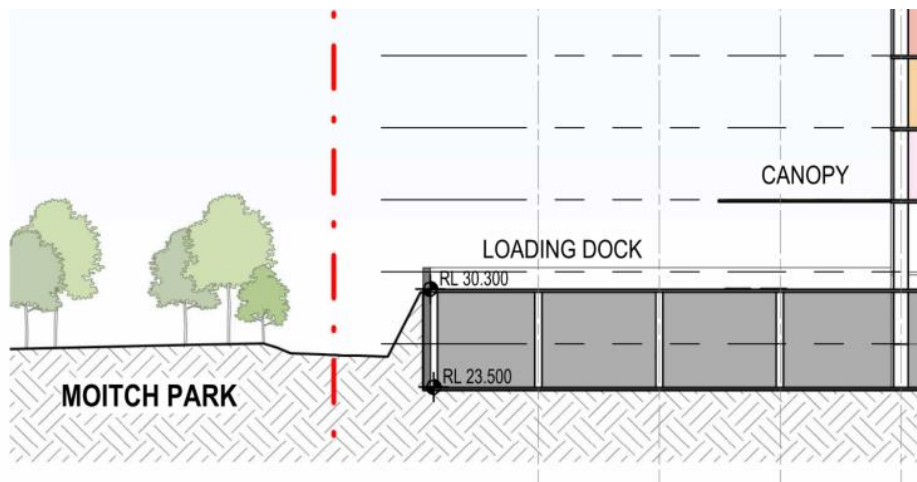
Moitch Park interface with Loading Dock and Plant Area below
